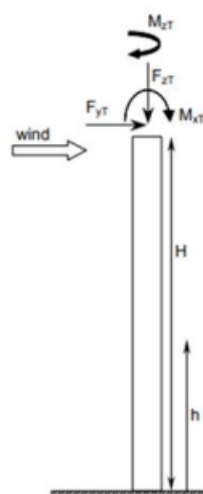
Cantilever beam model of a tubular tower subject to loading at the level of the hub.
